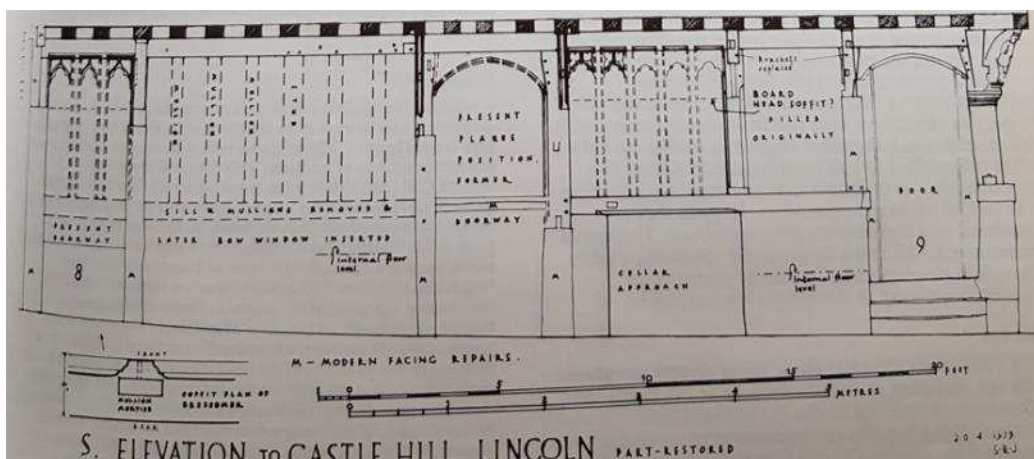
South elevation drawn in 1979 showing partially reconstructed presumed former traceried and other openings.²⁵
